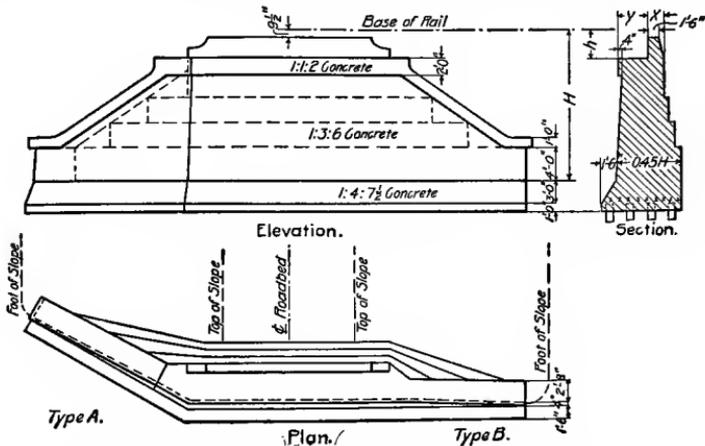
STRAIGHT AND SPLAYED ABUTMENTS. N. Y. C. & H. R. R. R.
